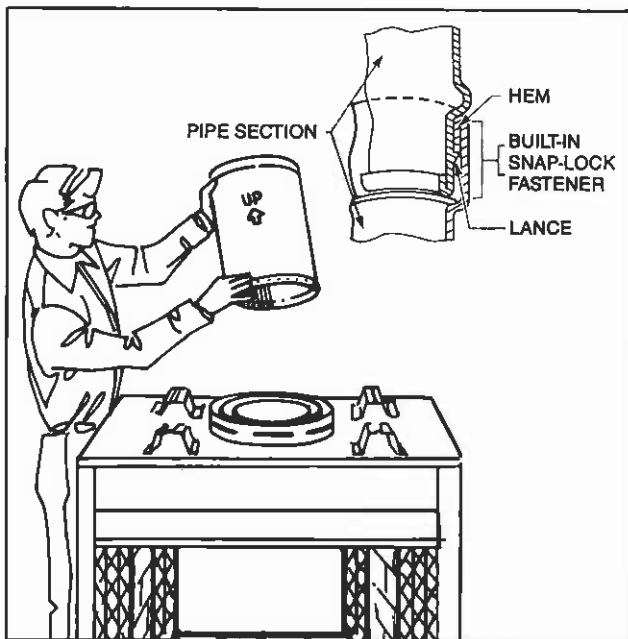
Use built-in snap-lock fasteners to attach chimney pipe sections.
